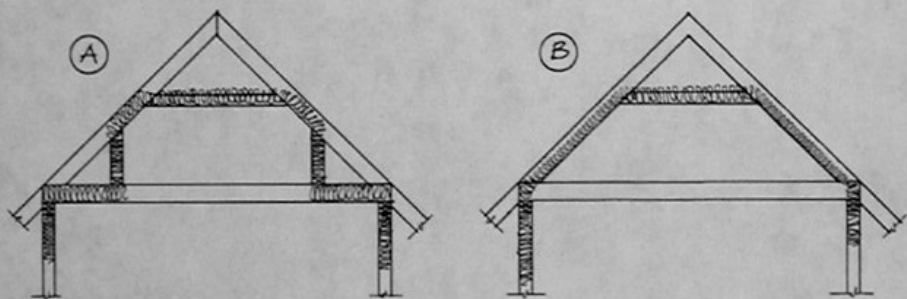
On the second floor of a cape, insulation option B is better than A on four counts: 1) less insulation, 2) easier job, 3) more heated floor area, 4) cheaper to heat.
